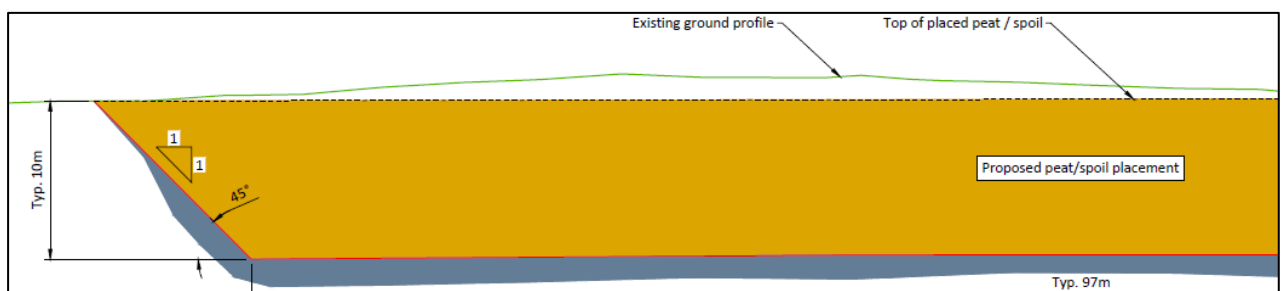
Borrow pits as per drawing nr. P20-216-0600-0020
